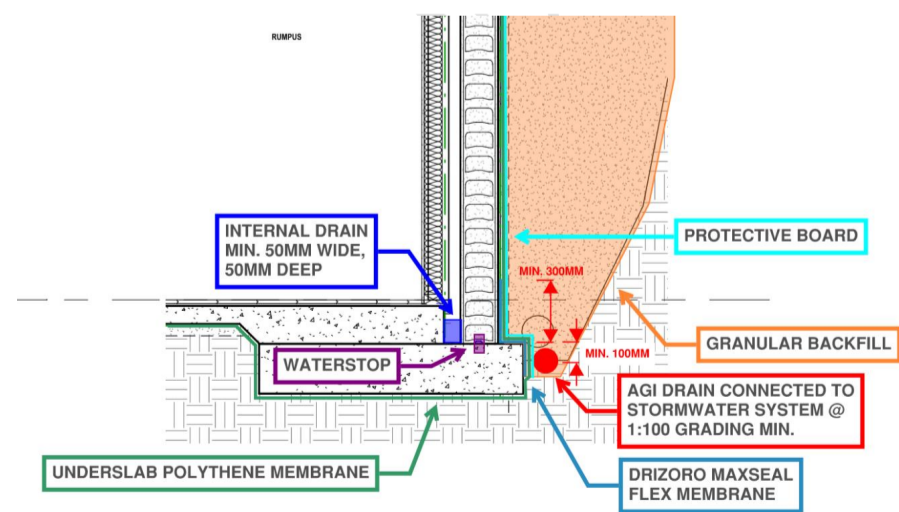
Typical Dintel® Wall Waterproofing Detail – Dintel to Basement Slab
